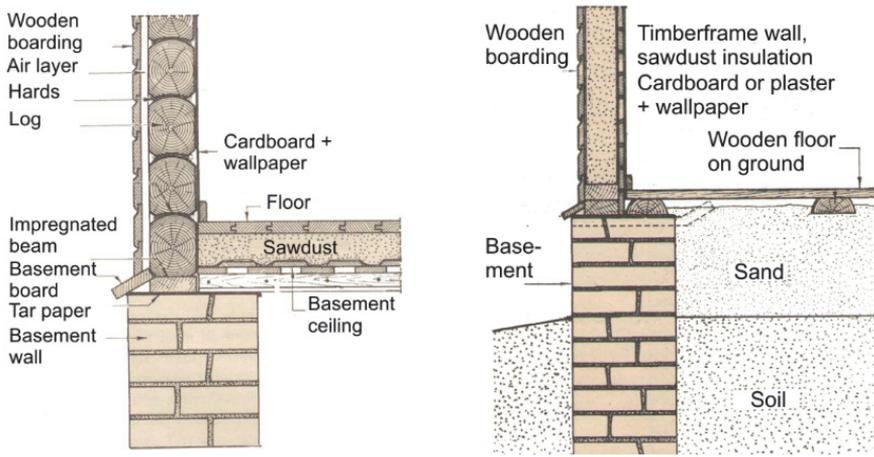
Connection of the external wall, basement and floor (building with a cellar (left); wooden slab on the ground (right)) (according to Veski (1943)).
